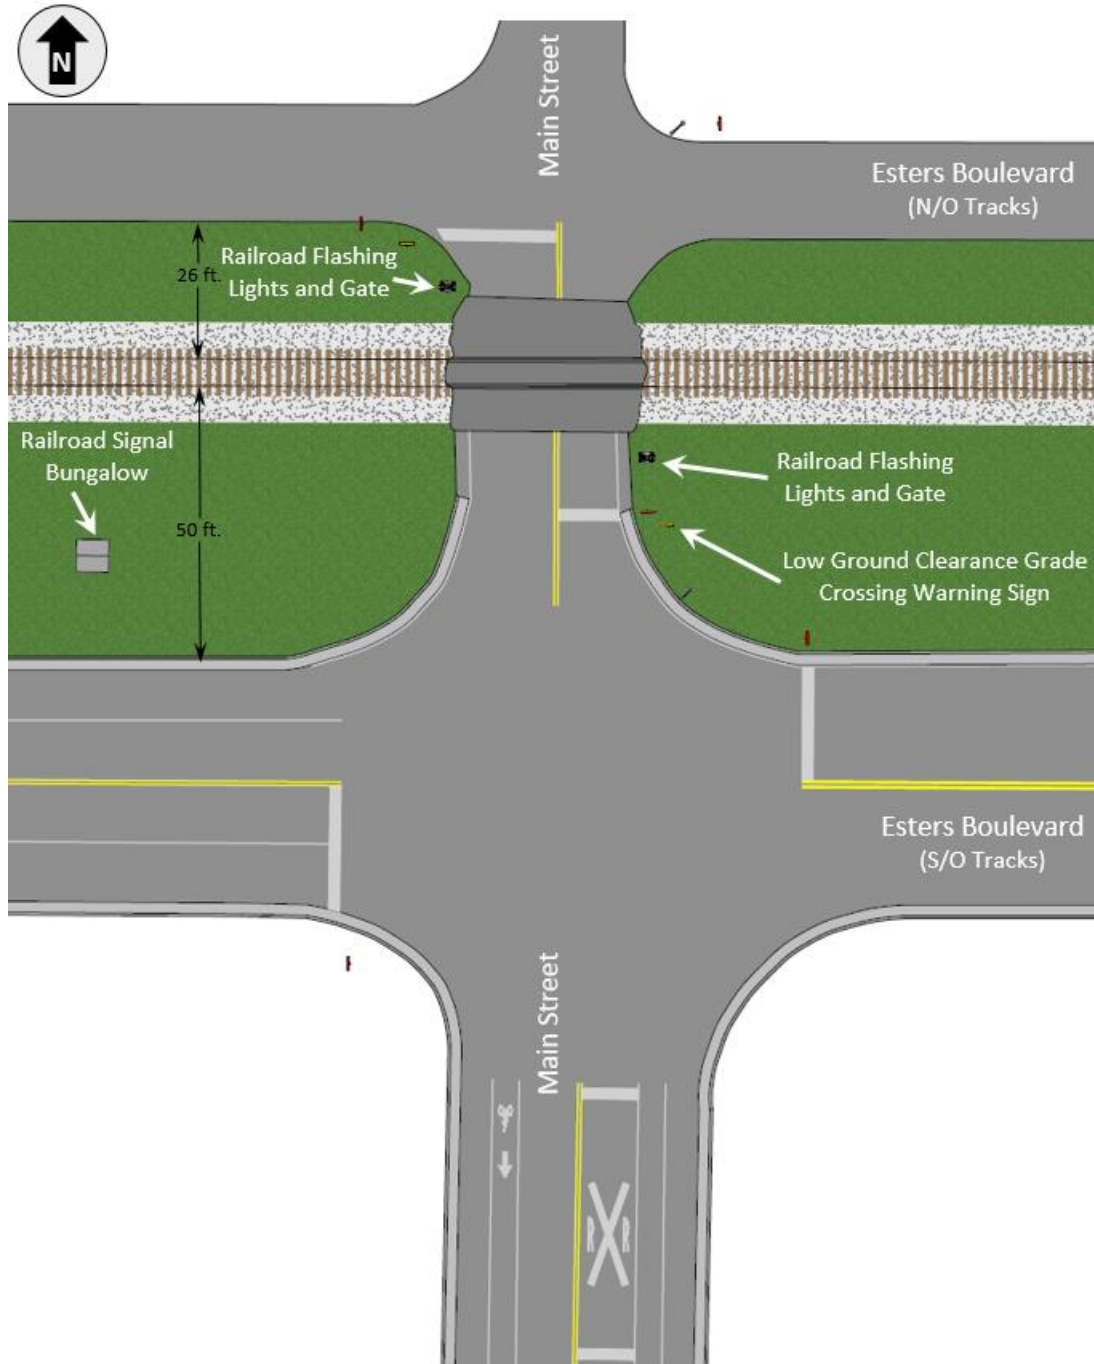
Layout of the Main Street and CSX Railroad Grade Crossing
